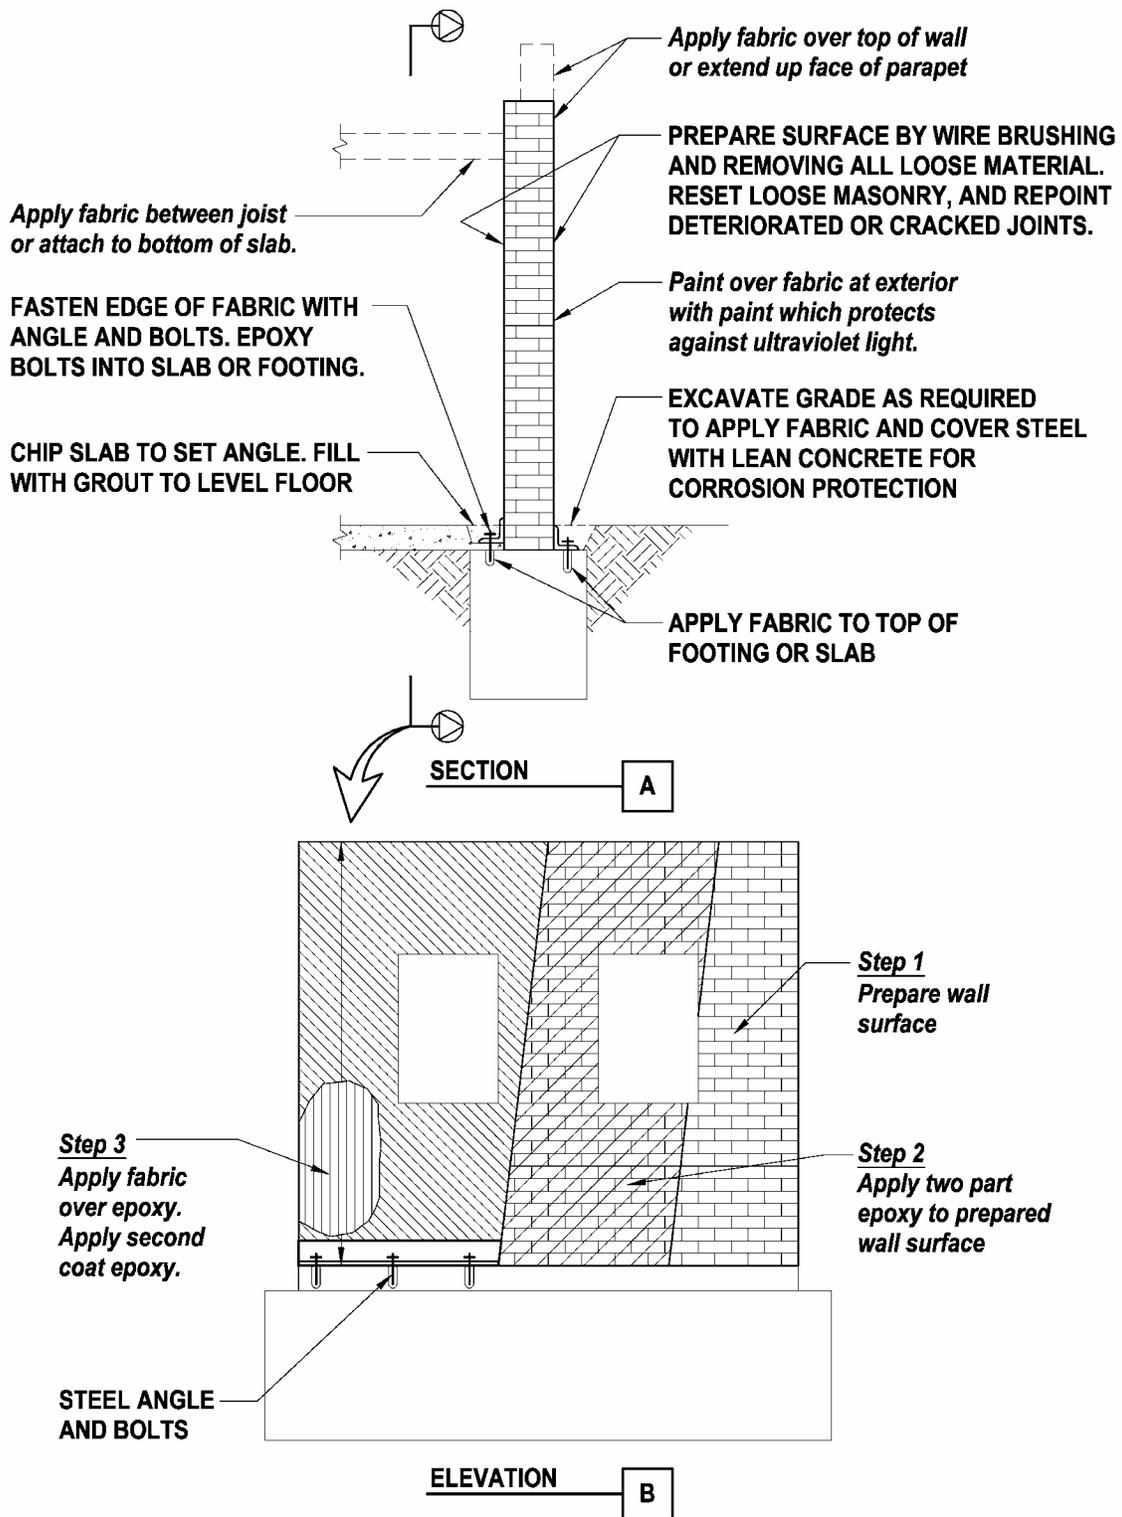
Fiber Composite Wall Overlay on URM Wall
